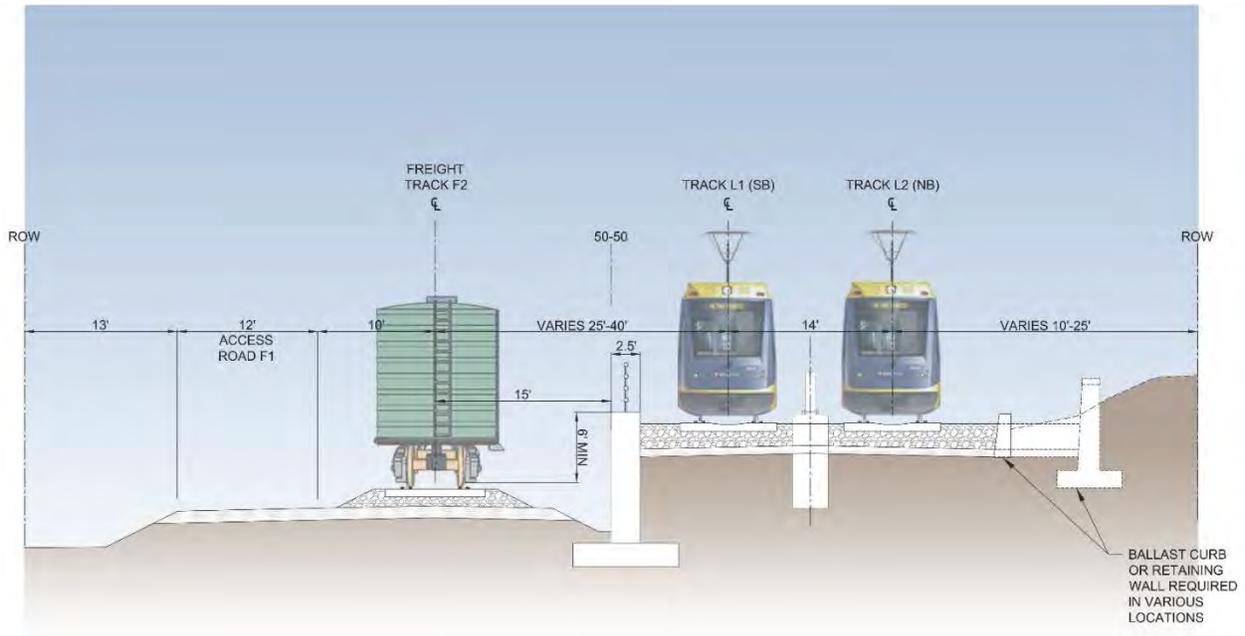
Typical Railway Section – Retained Embankment Corridor Protection
